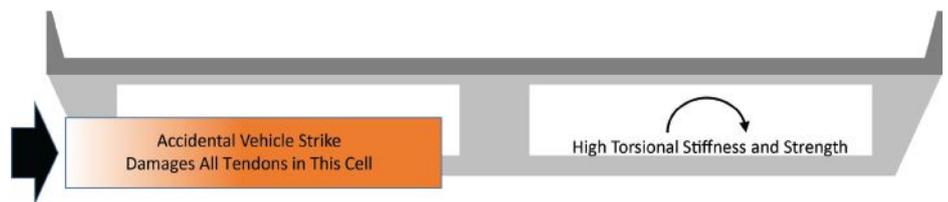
If one cell of a two-cell, three-span continuous post-tensioned concrete box girder is extensively damaged, the bridge would benefit from the high torsional strength and stiffness of the undamaged cell and continuity in the longitudinal direction. Figure: Dr. Oguzhan Bayrak.
